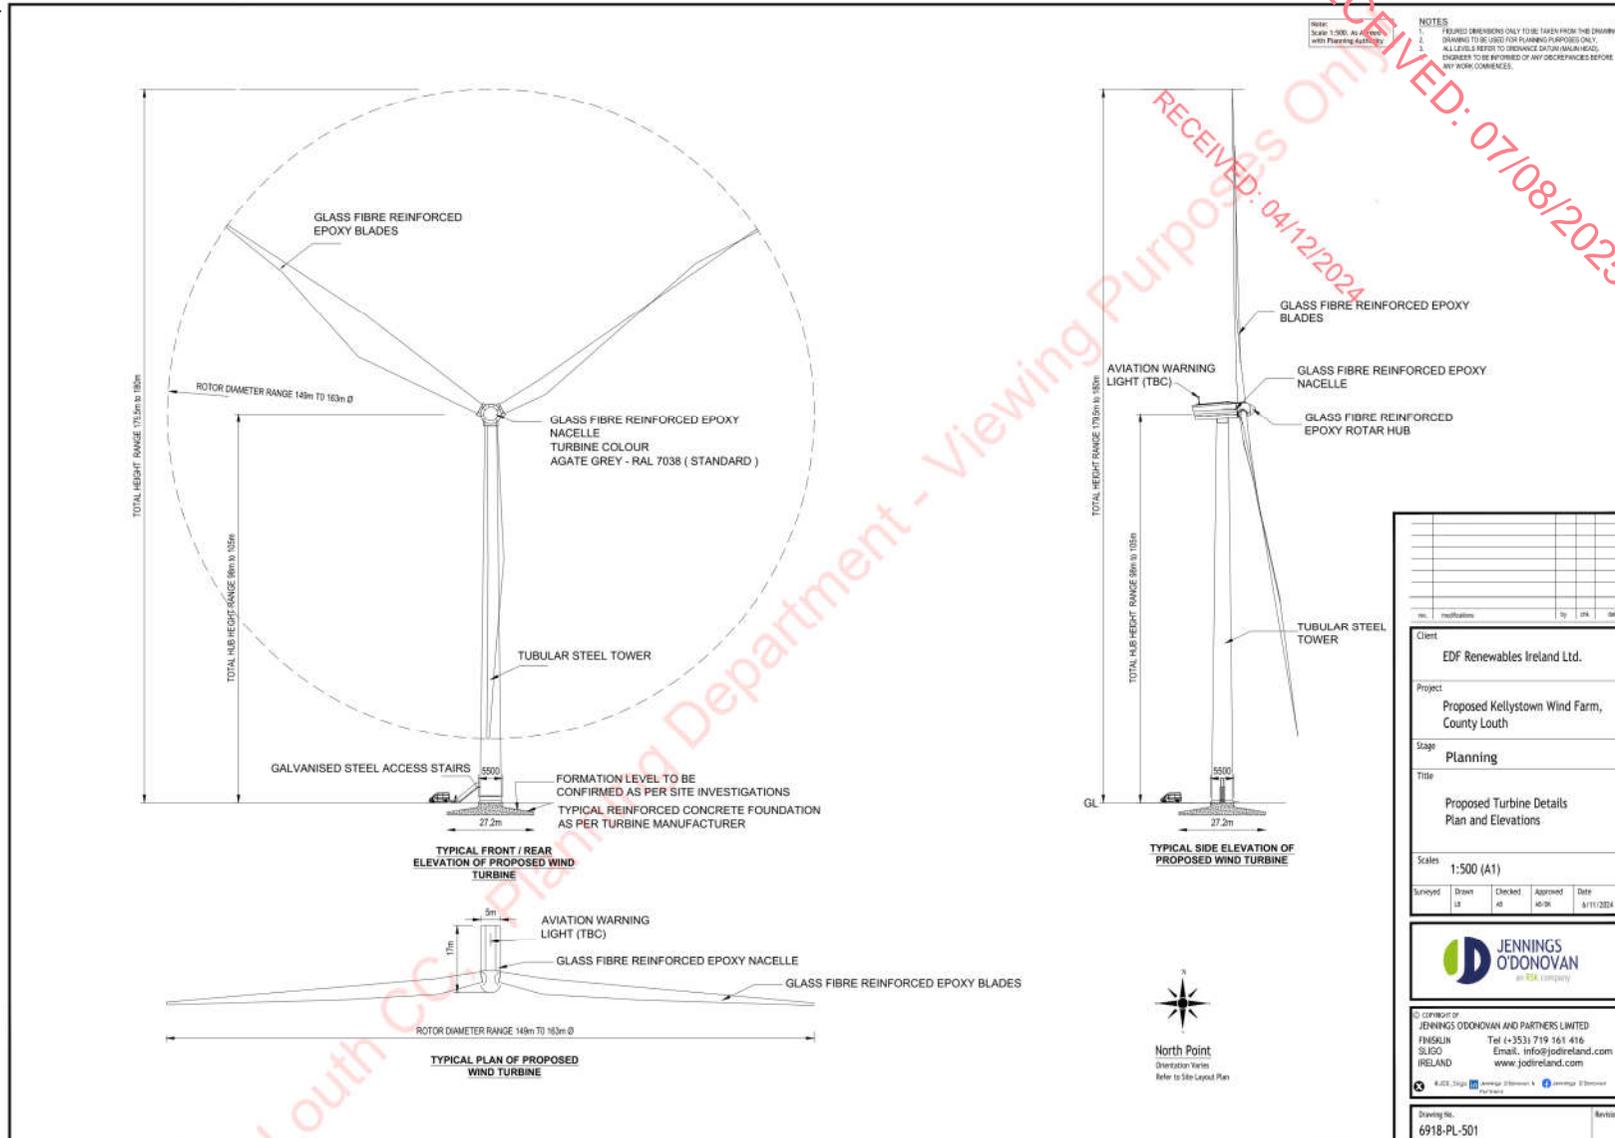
Proposed WTG details plan and elevation (Drawing no: 6918-PL-501, Ref. [7])
